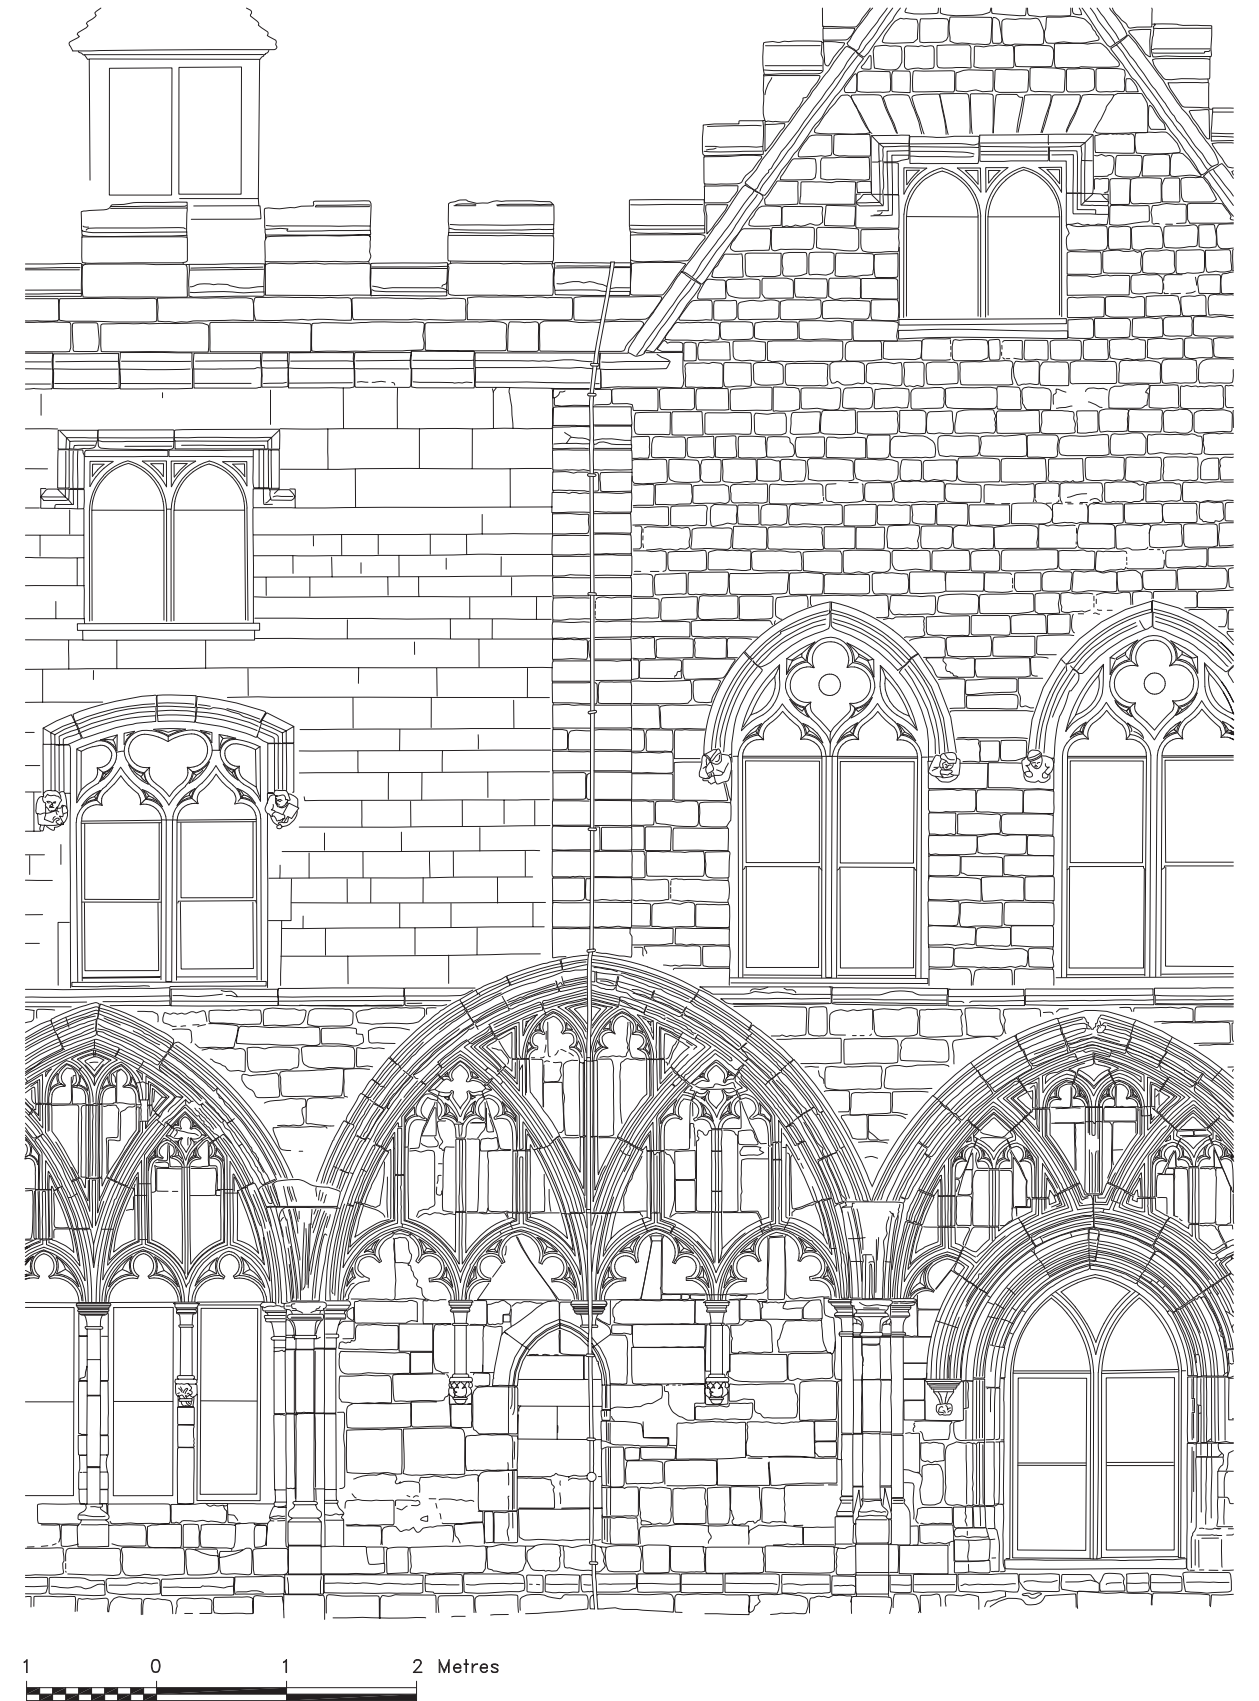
Photogrammetric survey 1:20 outline detail.
